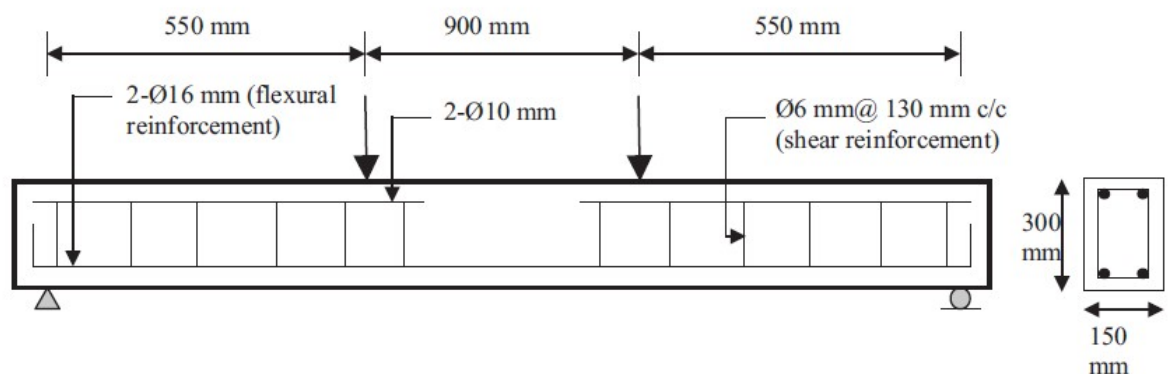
4: Reinforcement detailing and experimental setup of test beams (Alam and Riyami, 2017)
